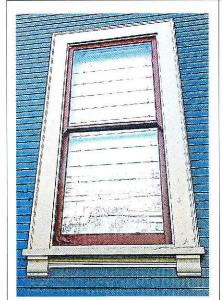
3390 View: Typical window; Photo Date: 12/2023; Camera Facing: NNW
